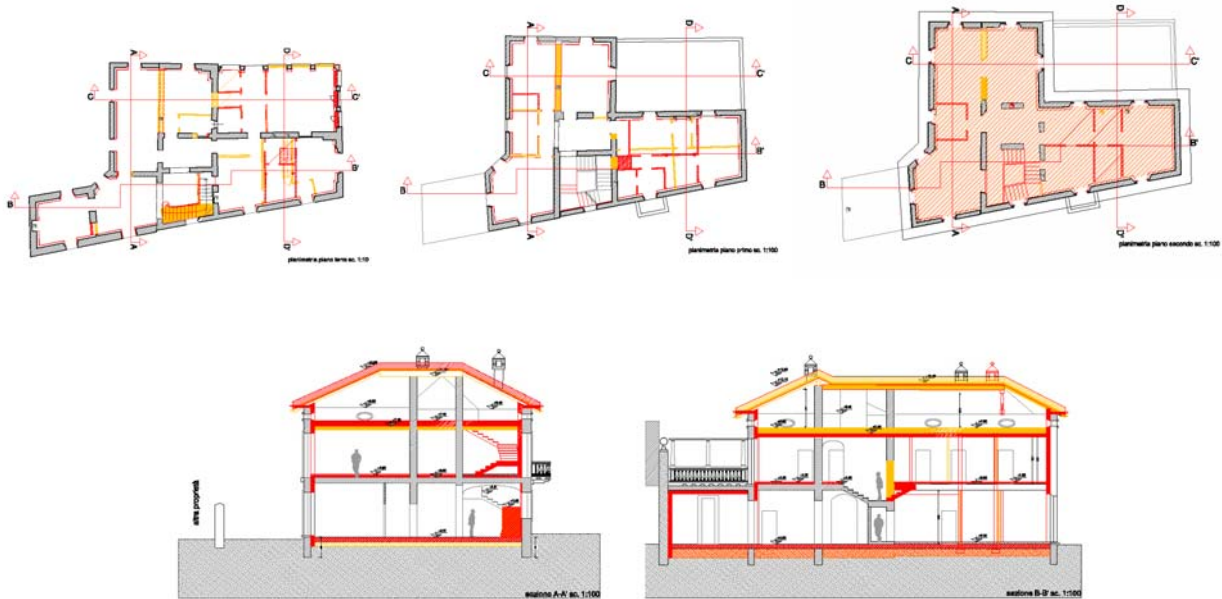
Floor plans of ground floor, first and second floor, and sections (demolition in yellow and new construction in red)
